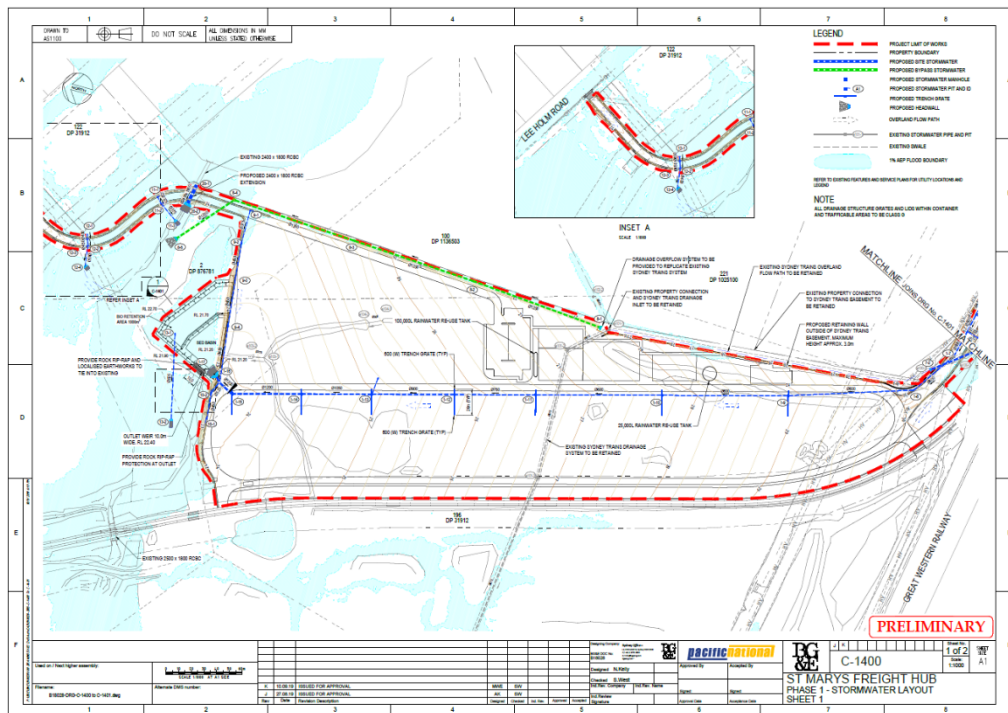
| Applicant's revised stormwater layout – Sheet 1 (Source: Applicant's RtS)
